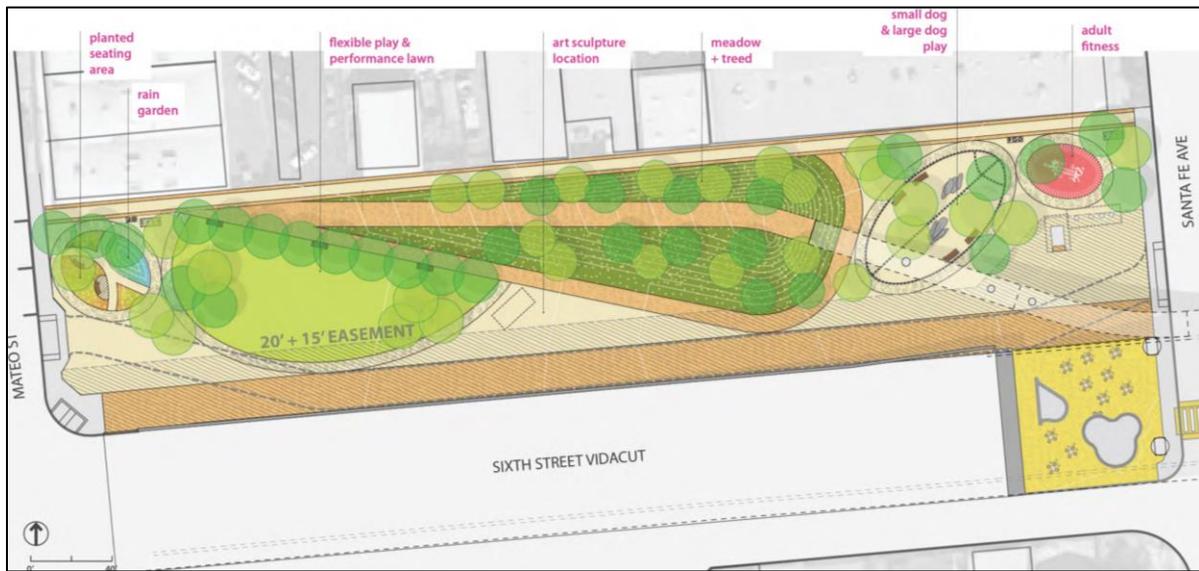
Conceptual plan of West Park area; view looking northeast from Mateo Street and 6th Street. (Hargreaves Associates, 2019)
